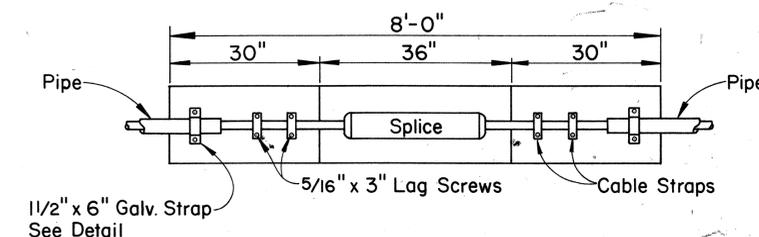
DETAIL OF CABLE CROSSING UNDER STORM CULVERTS-IRRIGATION PIPES, OTHER UTILITIES, OR FOREIGN PIPES
